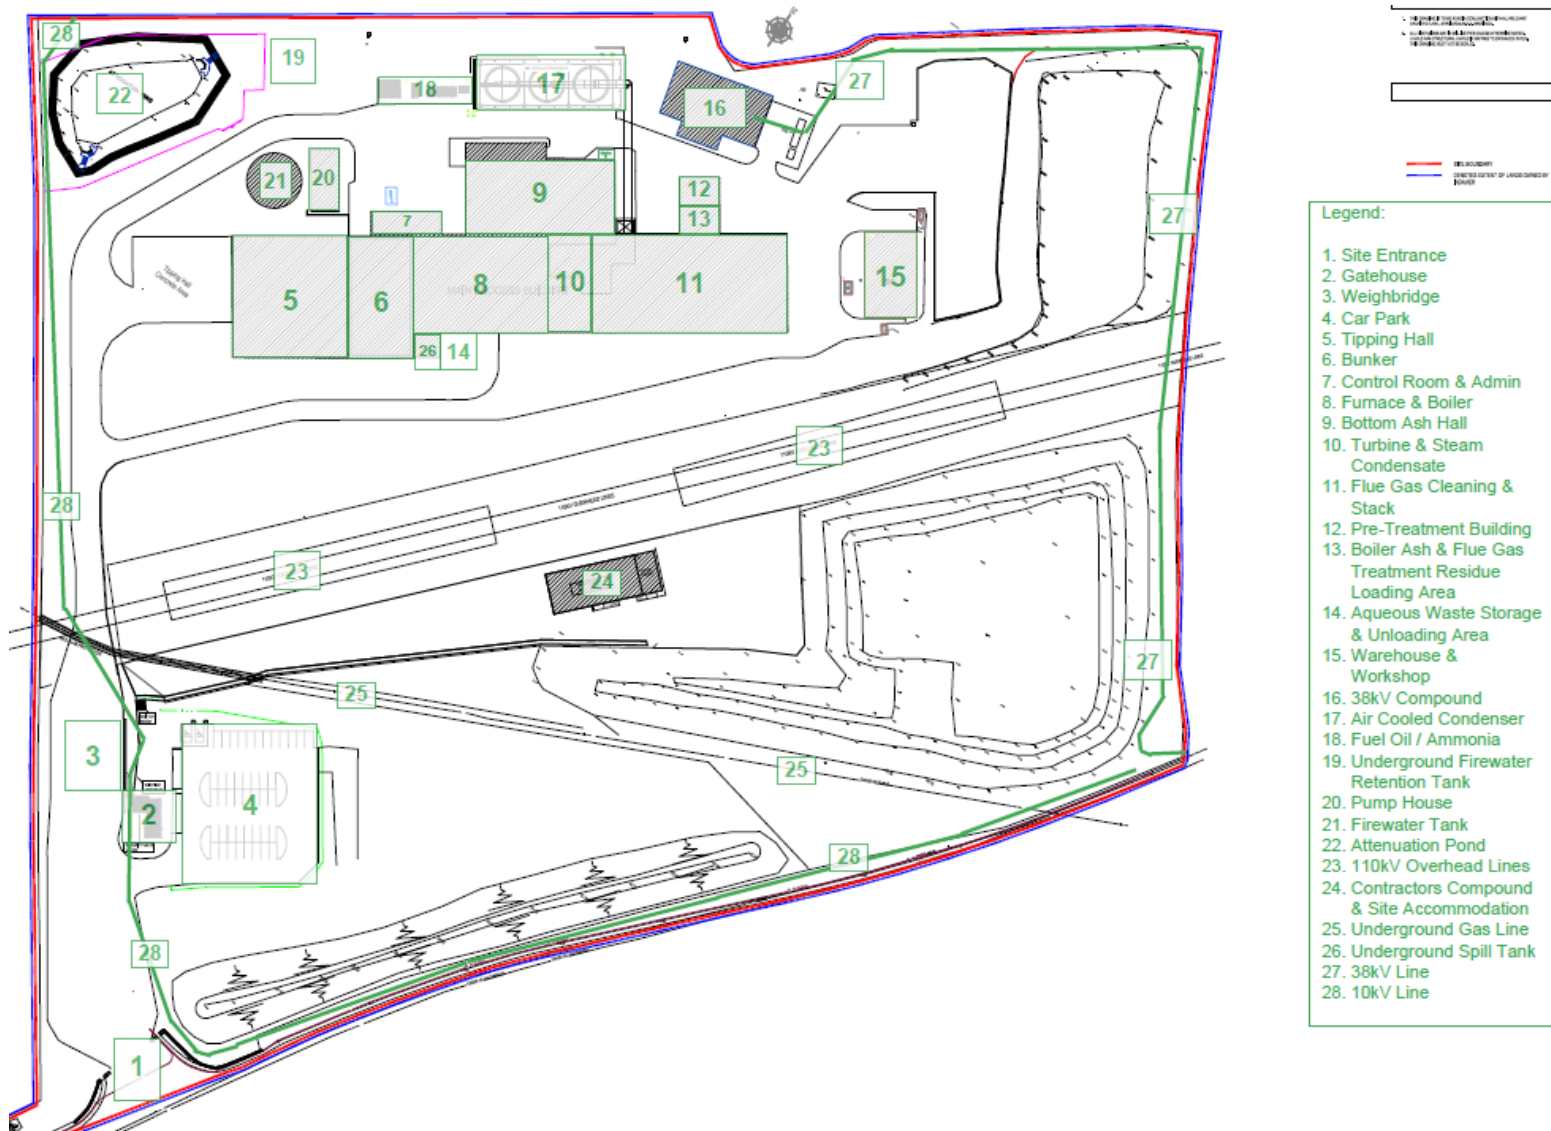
Existing Indaver Site Layout. Not to scale.
